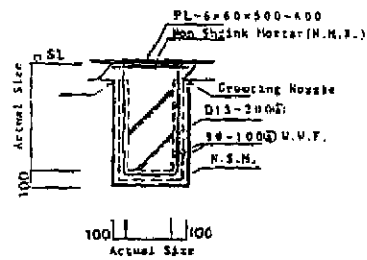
DETAILS OF BEAM RETROFITTED
